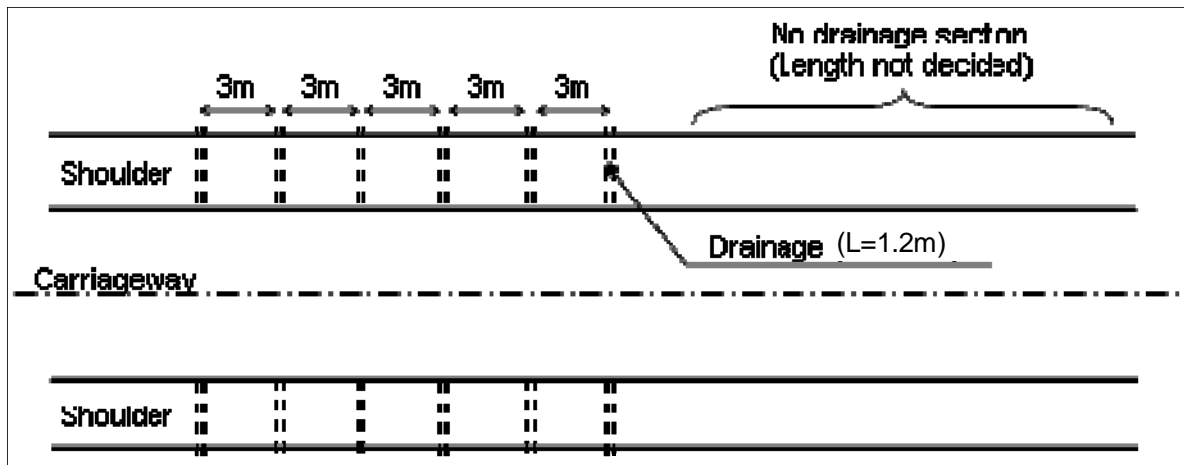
Layout of Drainage Layer (Not to Scale)
